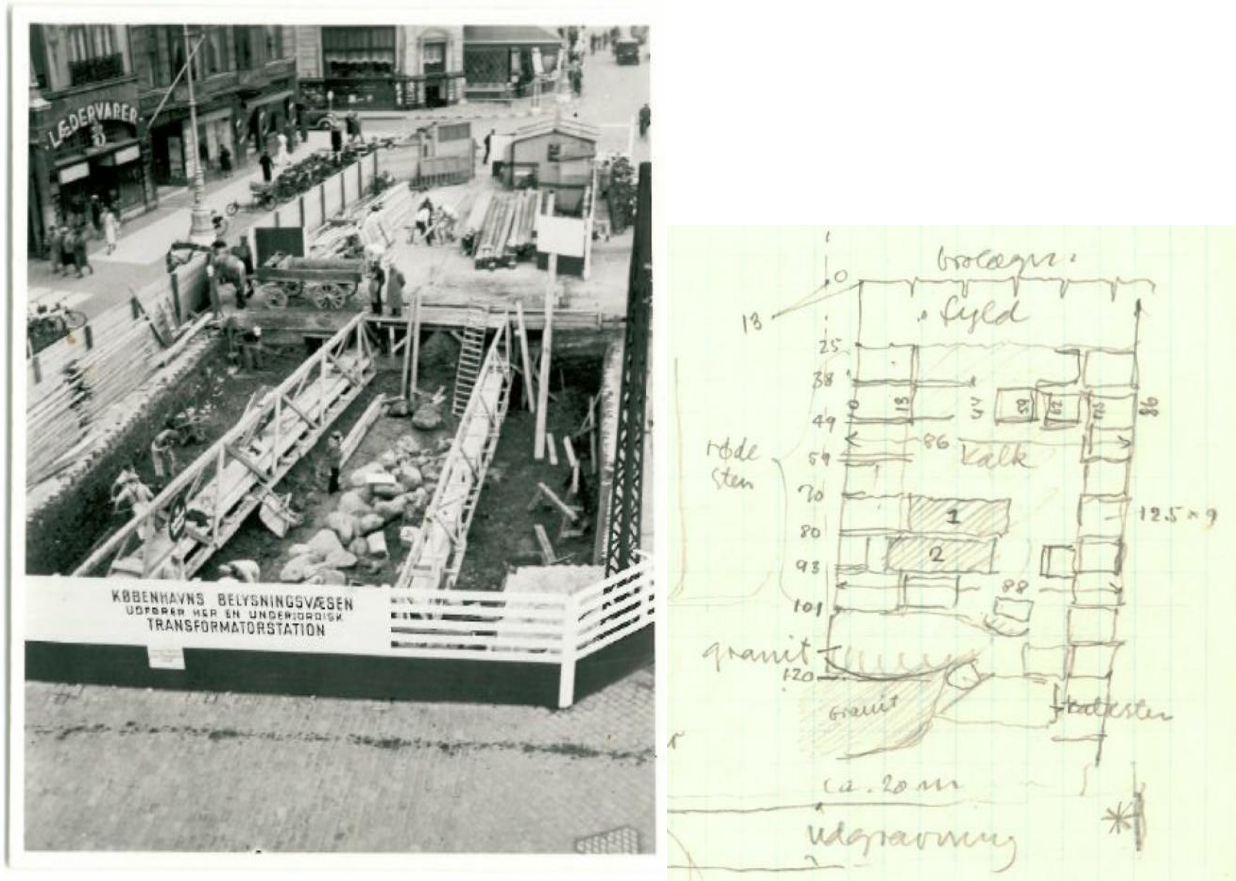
Earlier investigations of the city wall at Kongens Nytorv. Section through the brick wall and foundation stones documented between Lille Kongensgade and Østergade. From Jensen 1941 and Kayser 1969.
